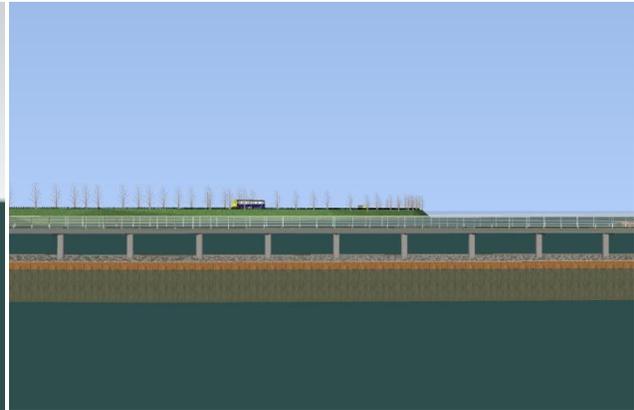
Walkway, Option 1, with existing jetty, northerly view
